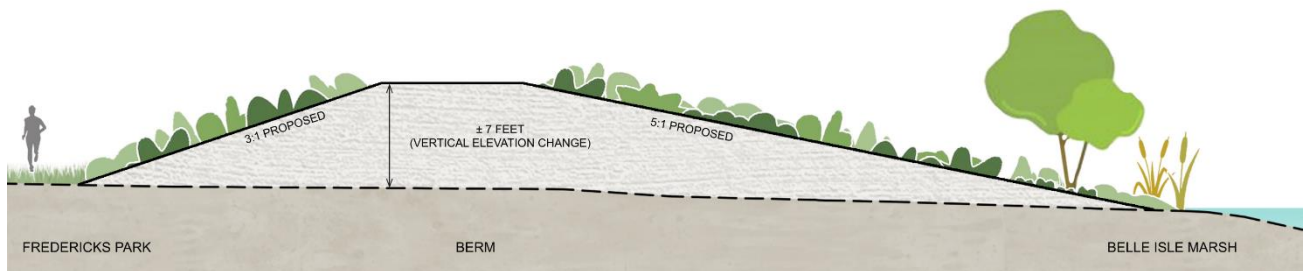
Alternative FP-1 Living Levee with Seawall—Illustrative Cross Section (Terraink)
